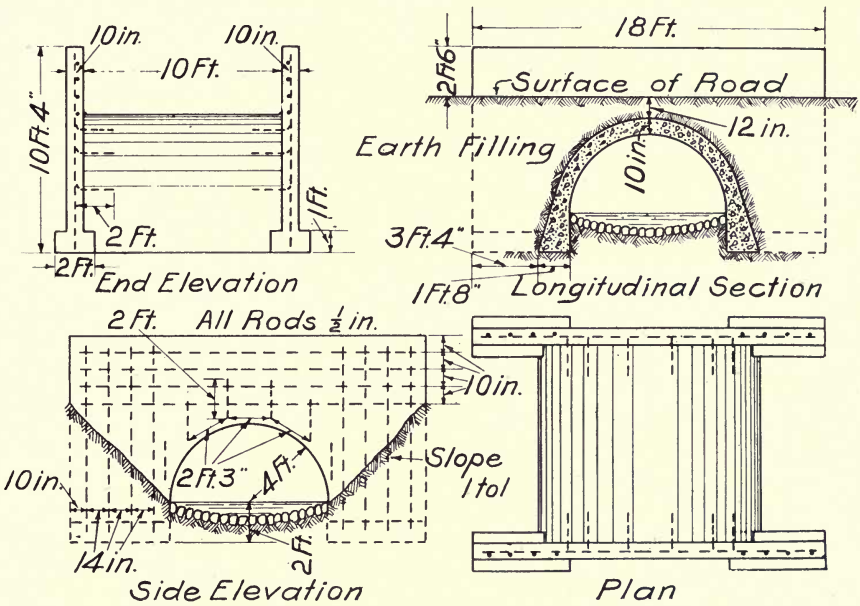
ARCH CULVERT FOR EIGHT-FOOT SPAN.
